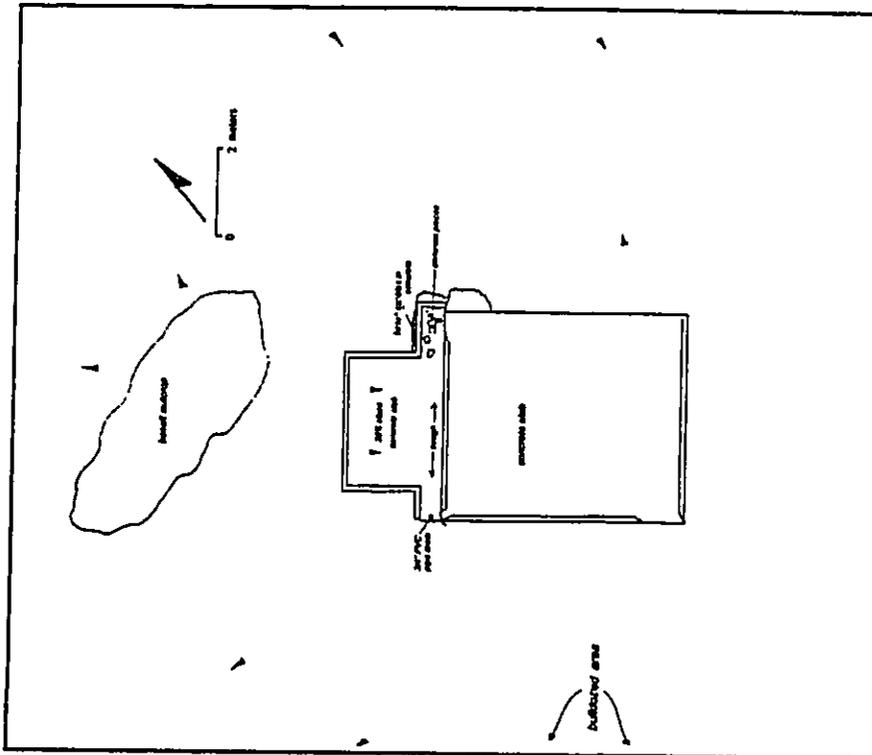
Plan view of Site S096—old slaughterhouse foundation.
